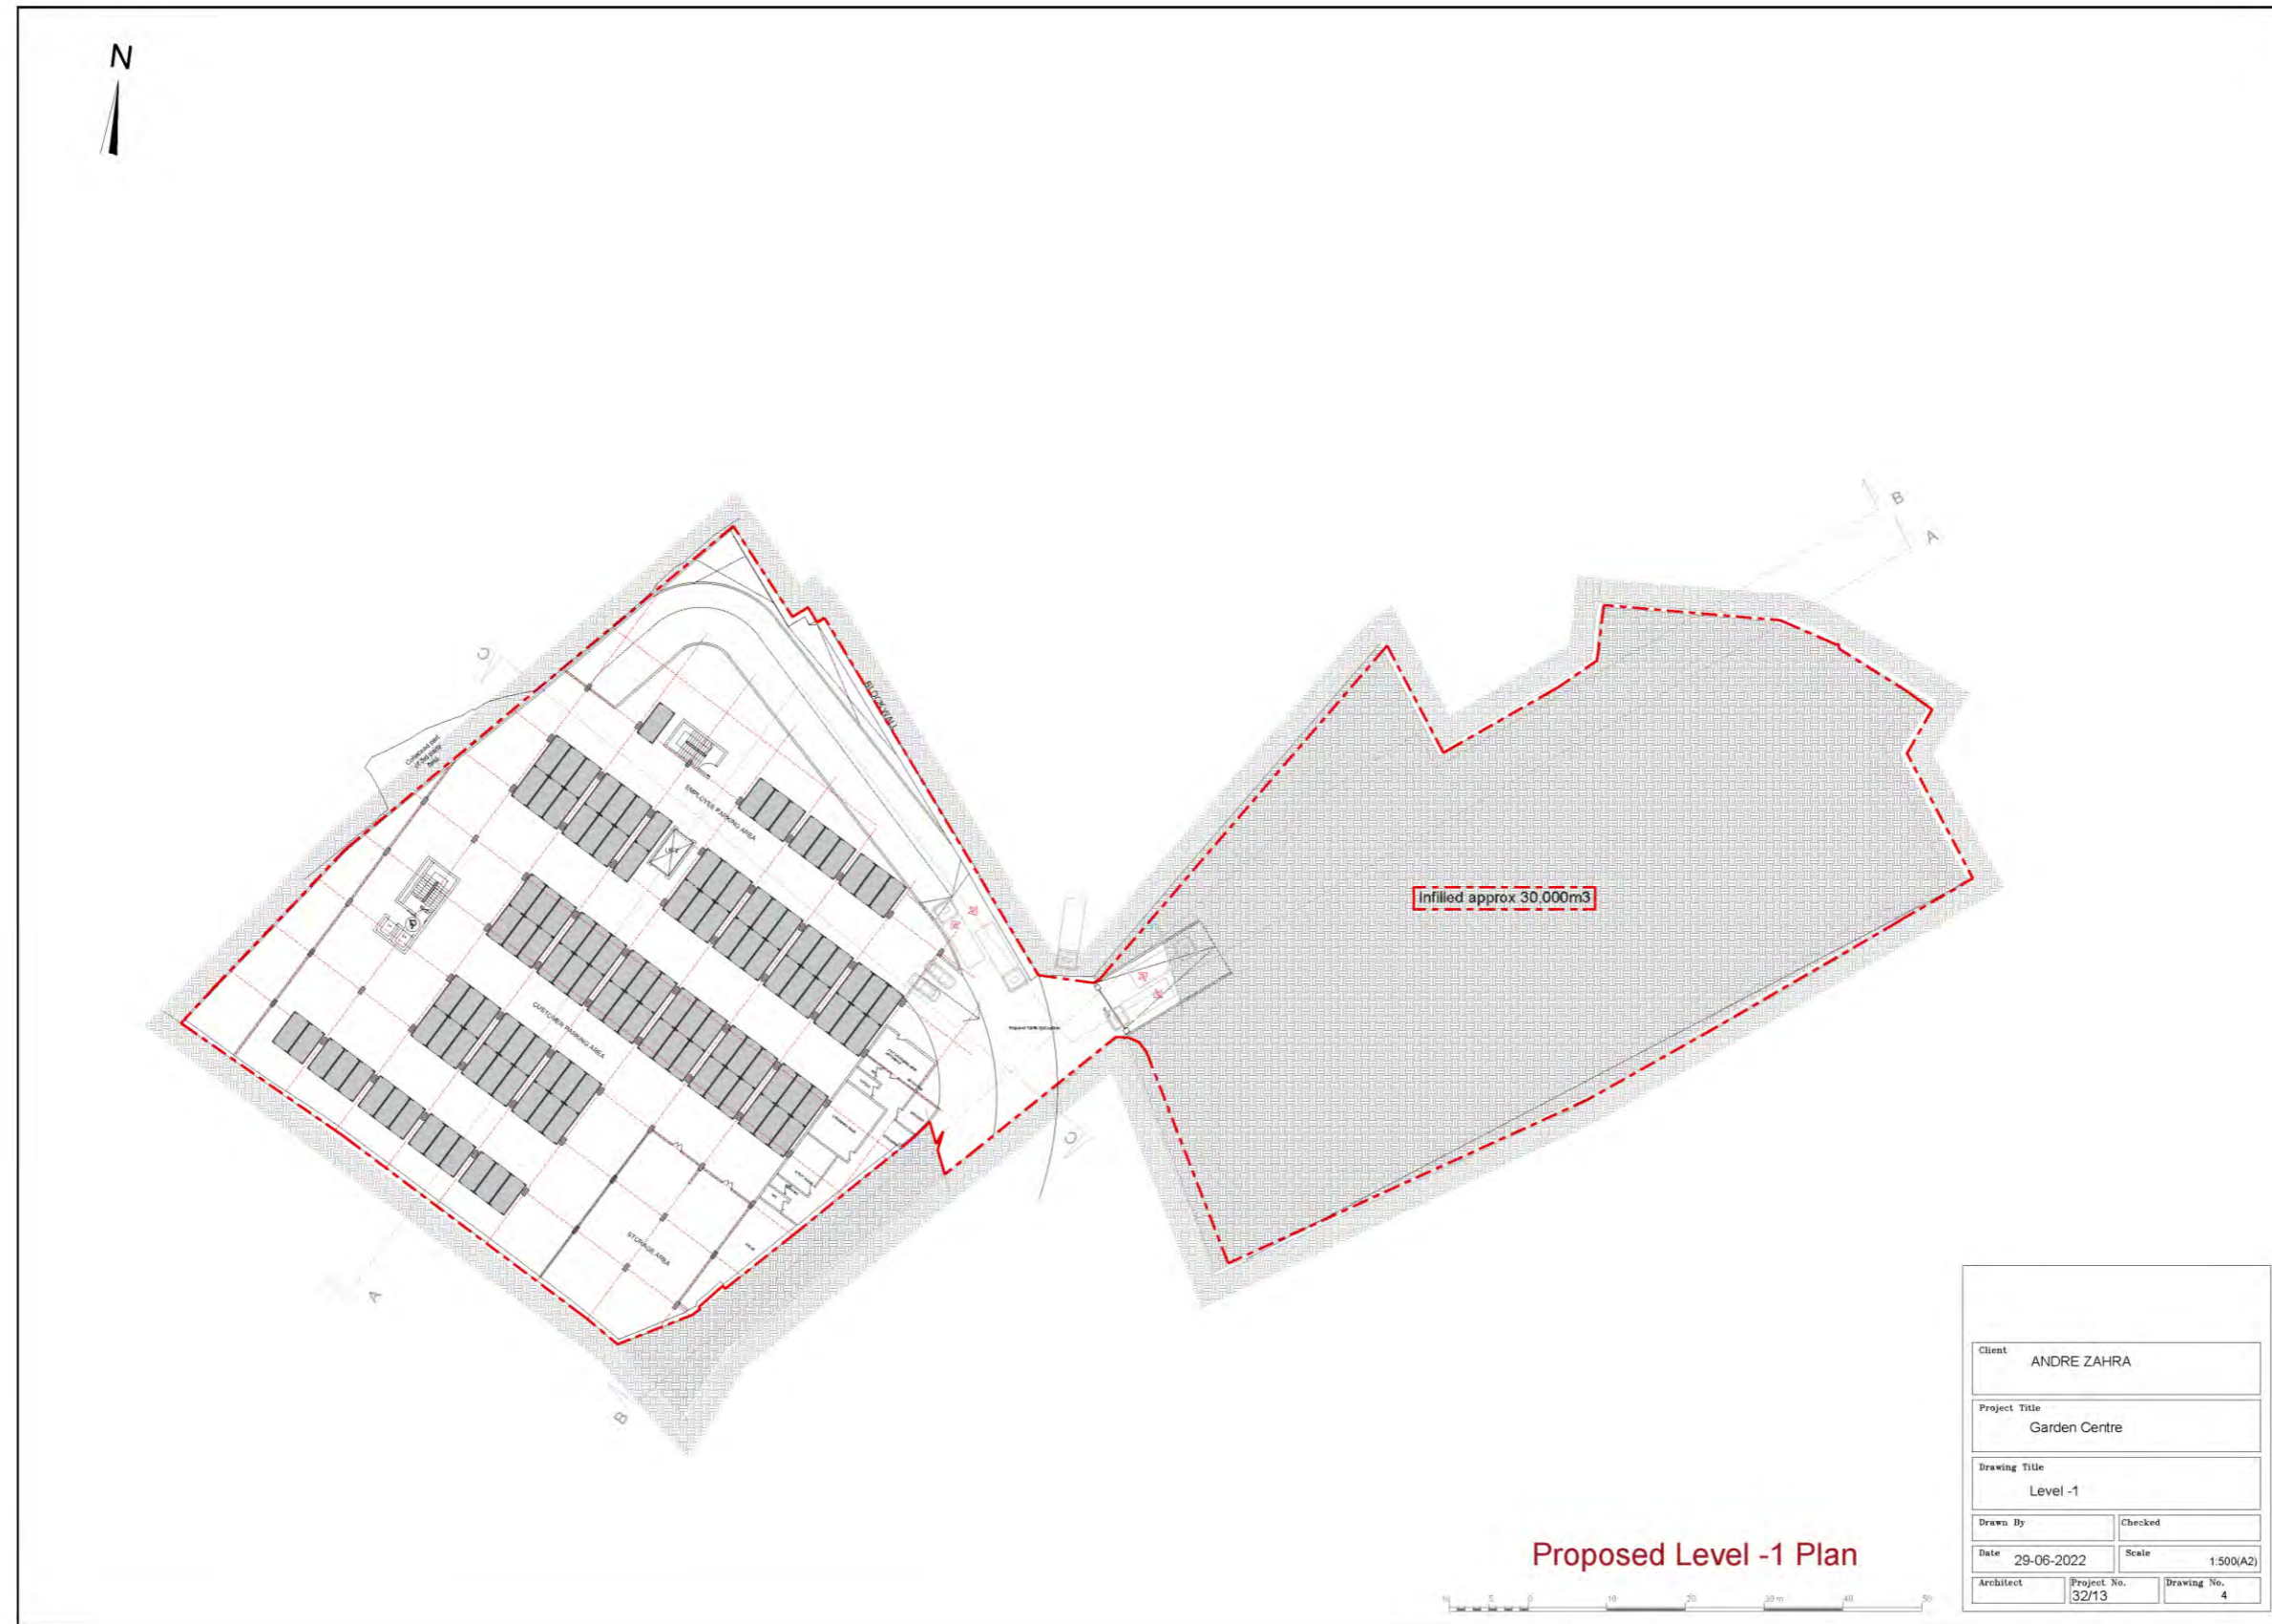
PROPOSED PLAN FOR LEVEL -1
